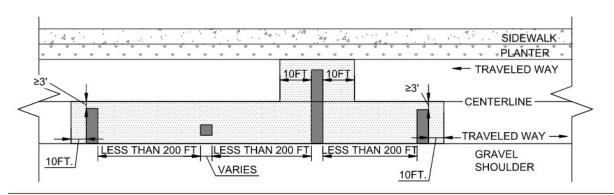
4 Overlay Limits for Trenches Within 3 Feet of the Crown of the Road
